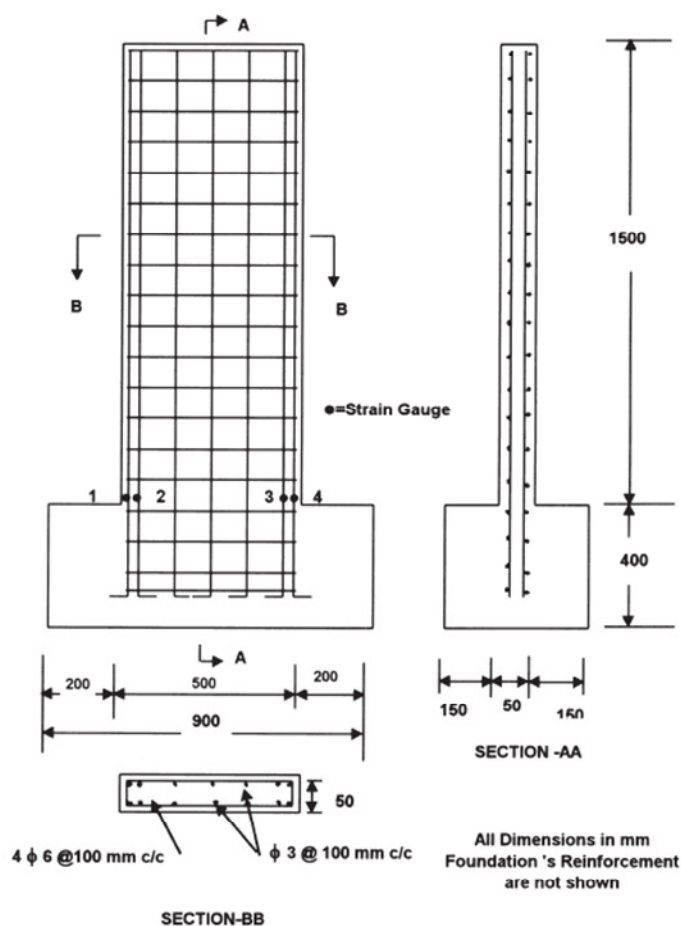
Reinforcement details of the wall specimens tested by Tasnimi (2000)
